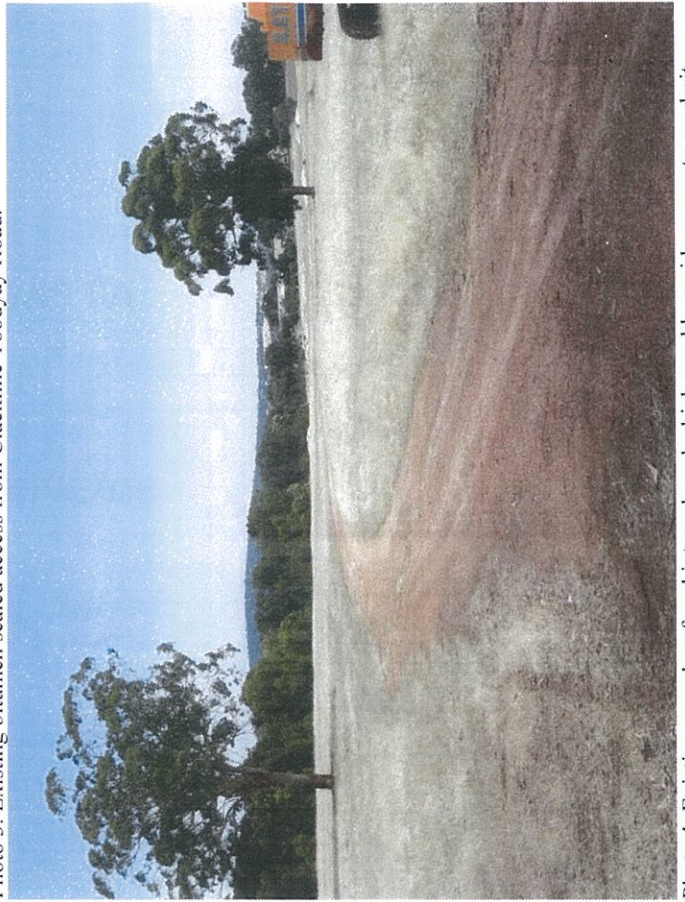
Existing gravel surfaced internal road which would provide access to sand pit.
